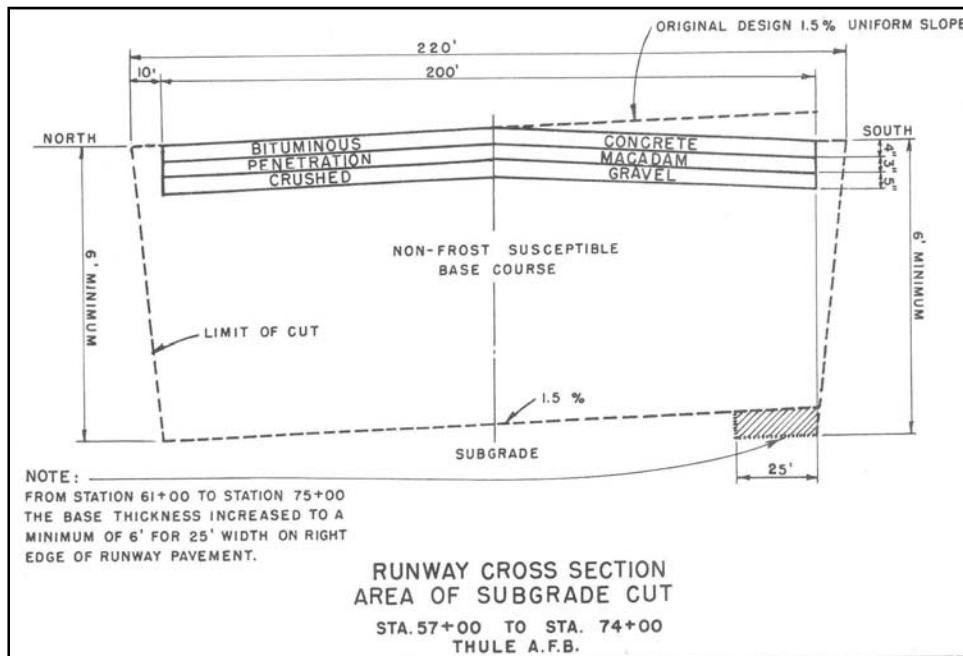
Cross section of the runway cut section from 57+00 to 74+00 showing initial design and mid-construction design change. The box excavation is also shown which was installed from 61+00 to 75+00 along the runway south limit (ACFEL 1955).
